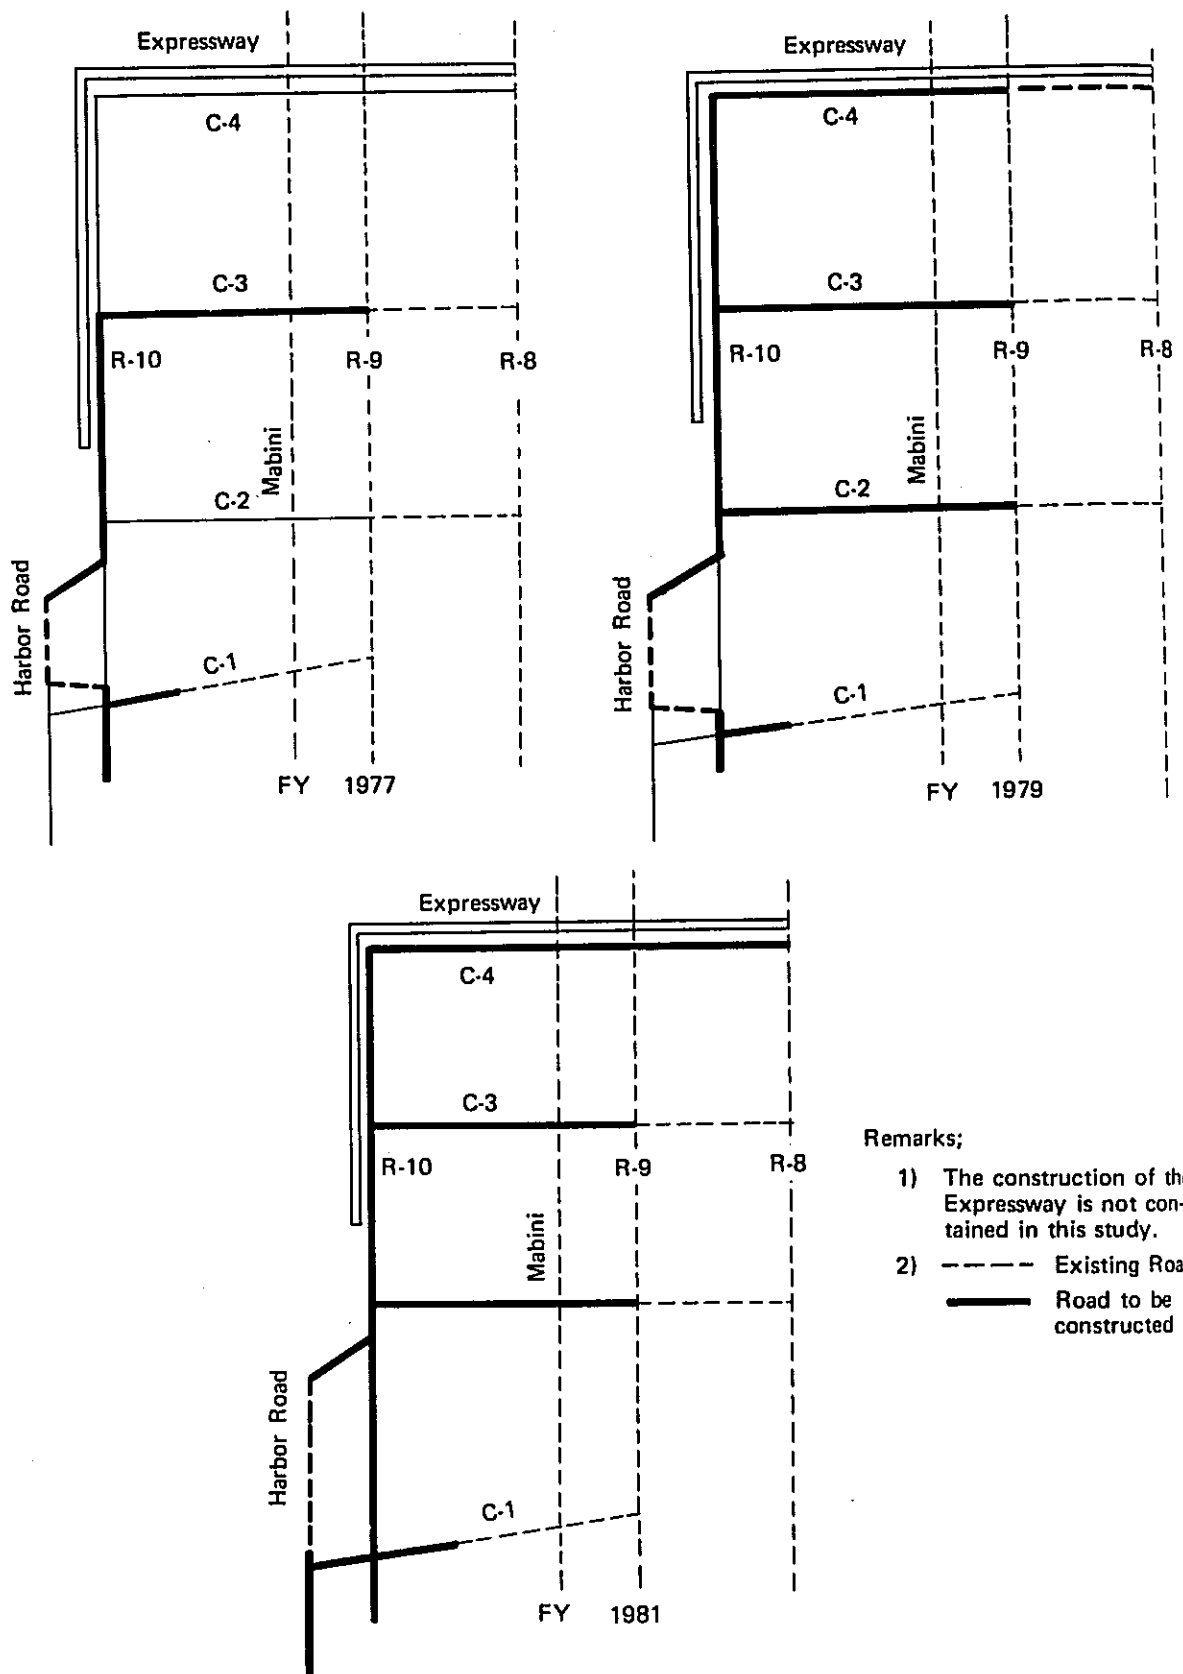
STAGE CONSTRUCTION PLAN OF PROJECT ROADS
